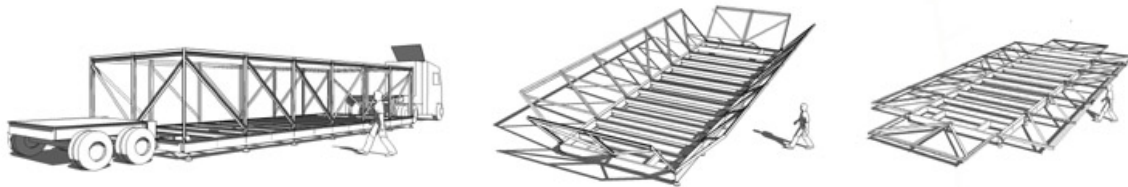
Transport arrives on site and the rear bogey and gooseneck are removed. Truss structure is rotated to provide structure for wraparound cedar deck.
